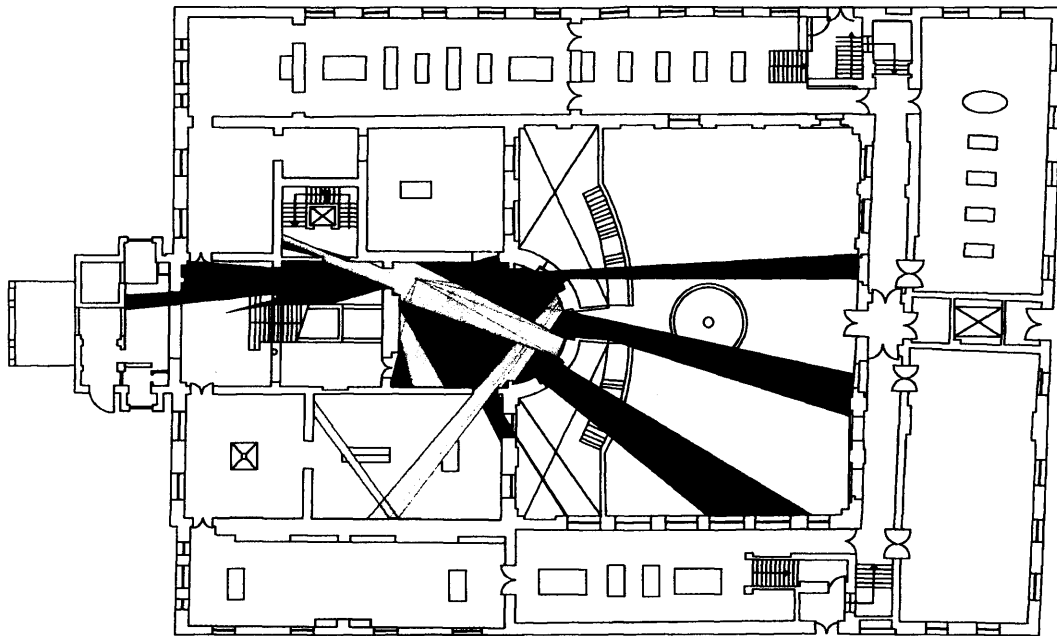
Wallace Collection, isovist from one point of entrance to the Dining Room.
